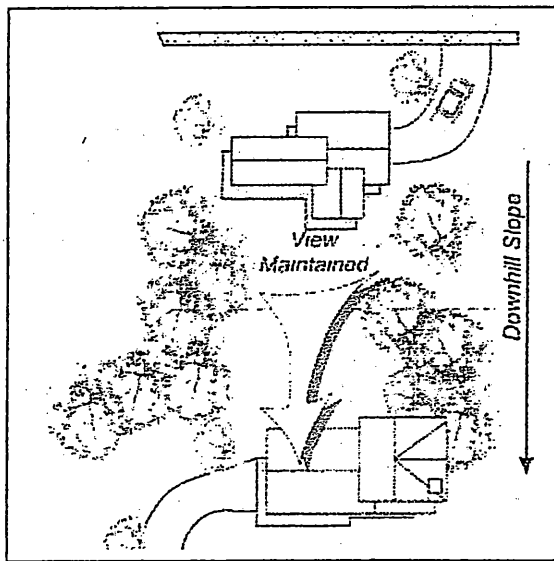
Example of Preferred Location of Second Floor to Preserve Views
